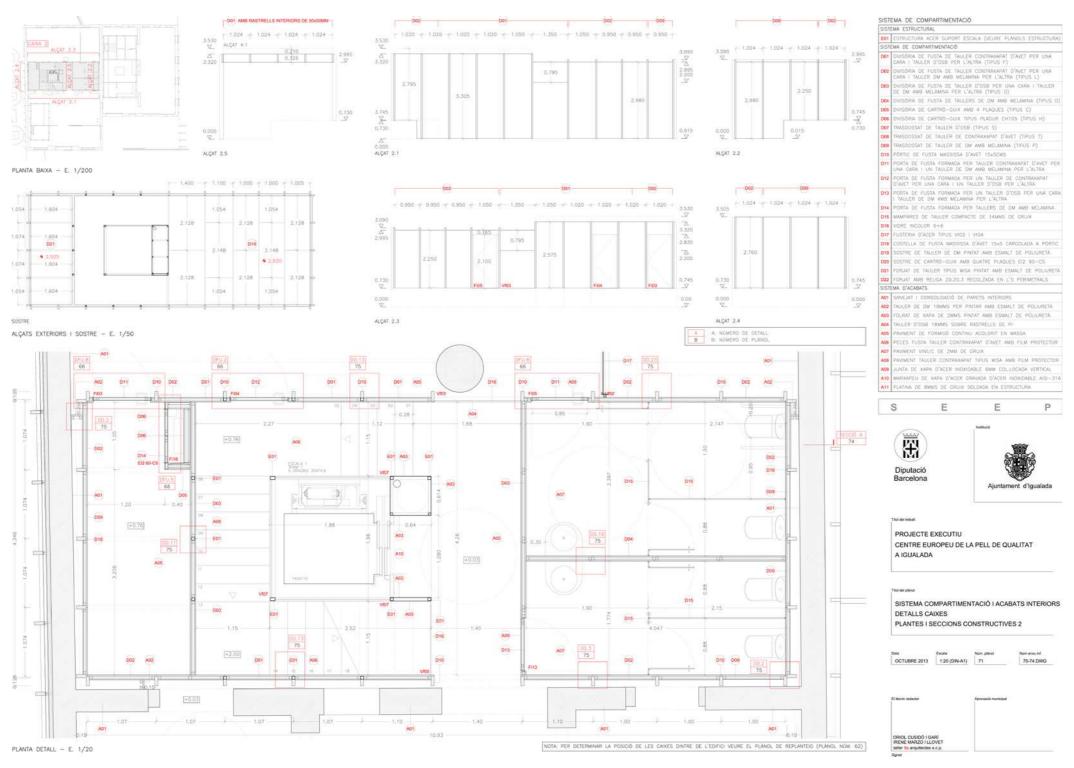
Assembly plan of the new semi-prefabricated wooden boxes. © Taller 9s Arquitectes
